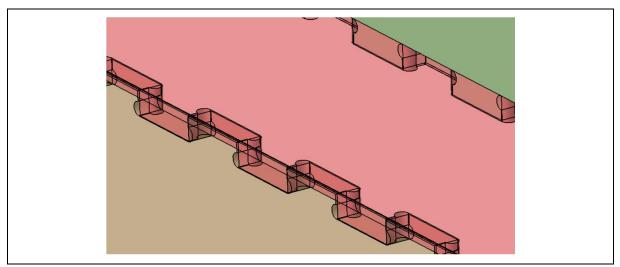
EXAMPLE OF TONGUE & GROOVE
